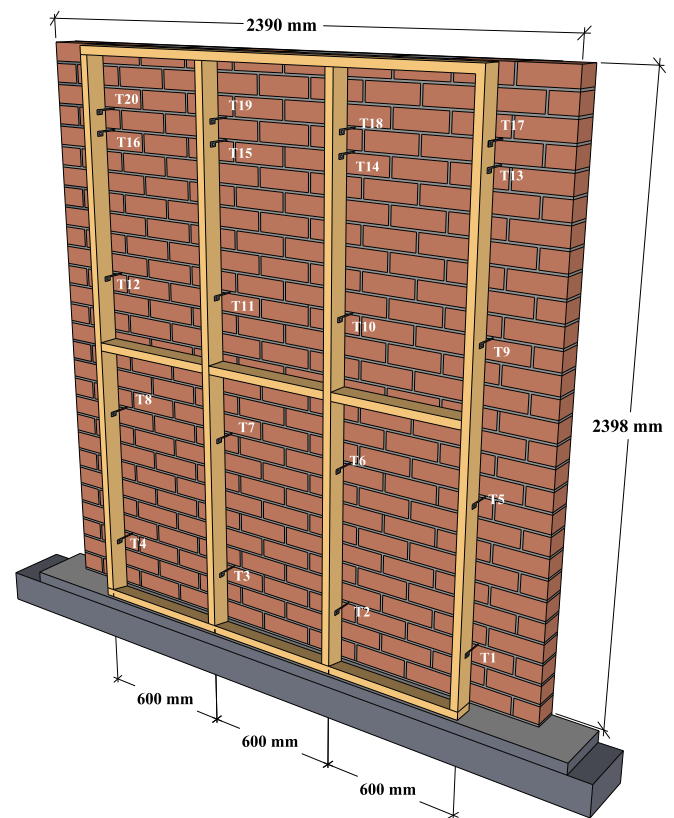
Elevation of the full-sized URM veneer wall system [22]
